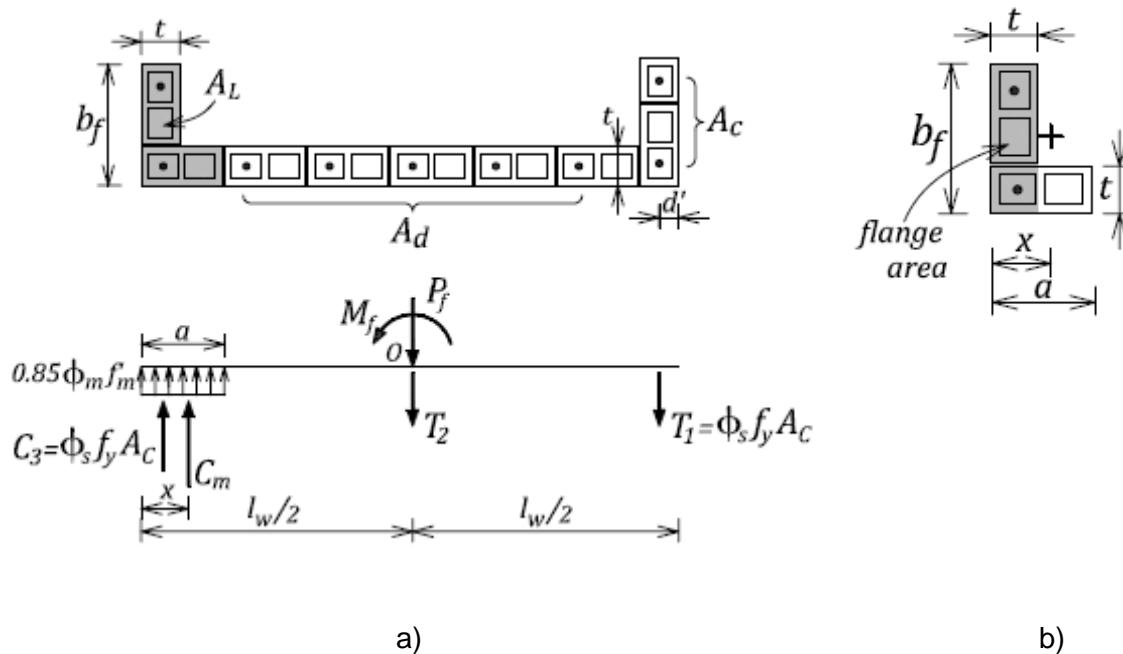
Flanged wall section: a) internal force distribution; b) flange geometry.
